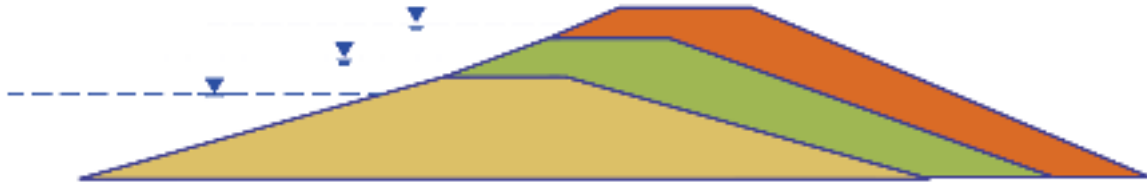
Downstream Construction Method used for Tailings Embankments
